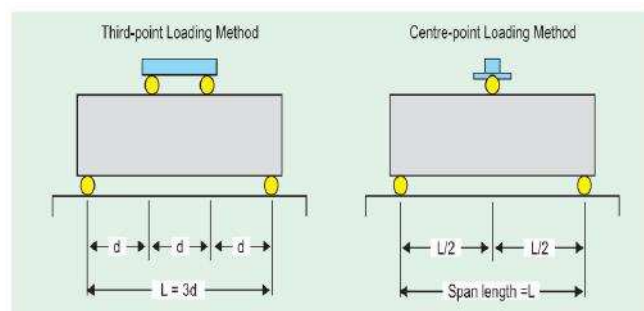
Flexural Test for Beams- Third Point Loading and Centre Point Loading
